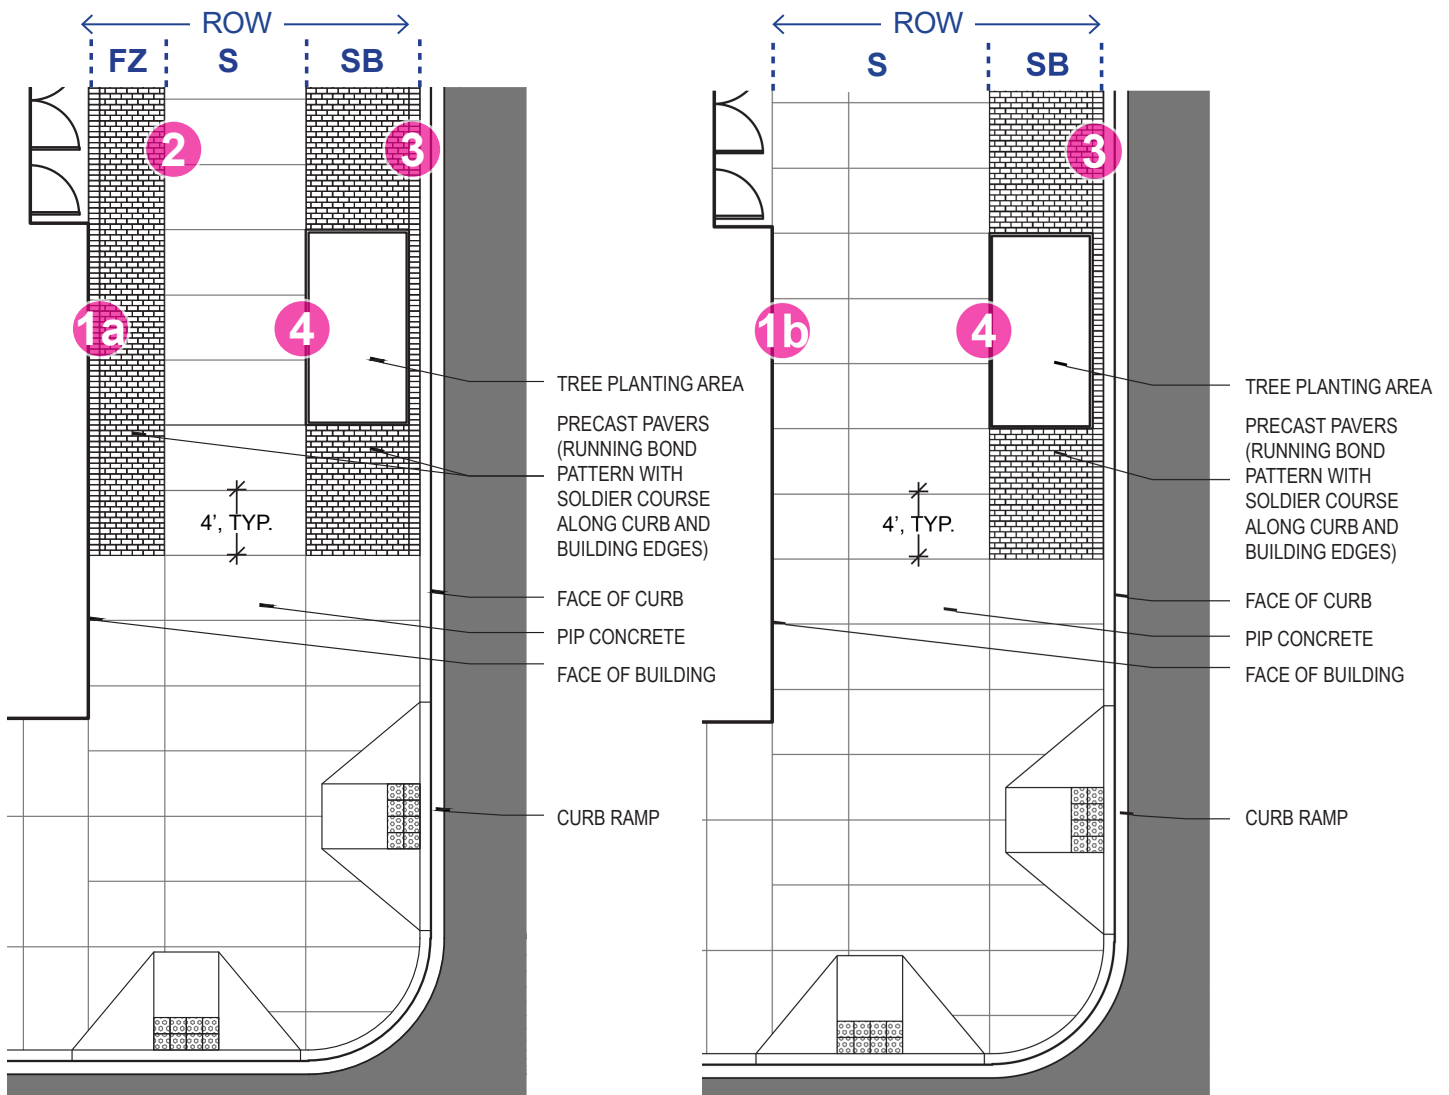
Typical streetscape paving plans for streets with and without Frontage Zones (FZ)
